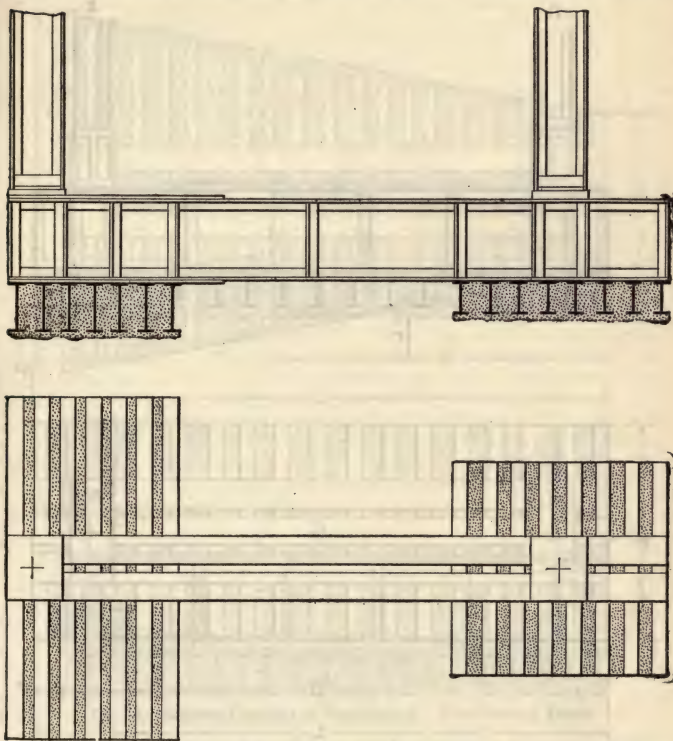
Cantilever Foundation. Grillage Fulcrum
